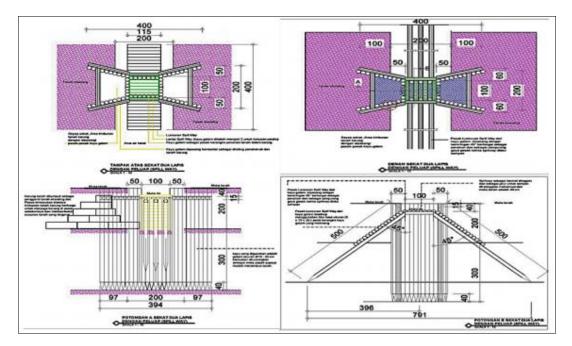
Example of Design Drawing of Two Ply Wood Block with Spillway System
